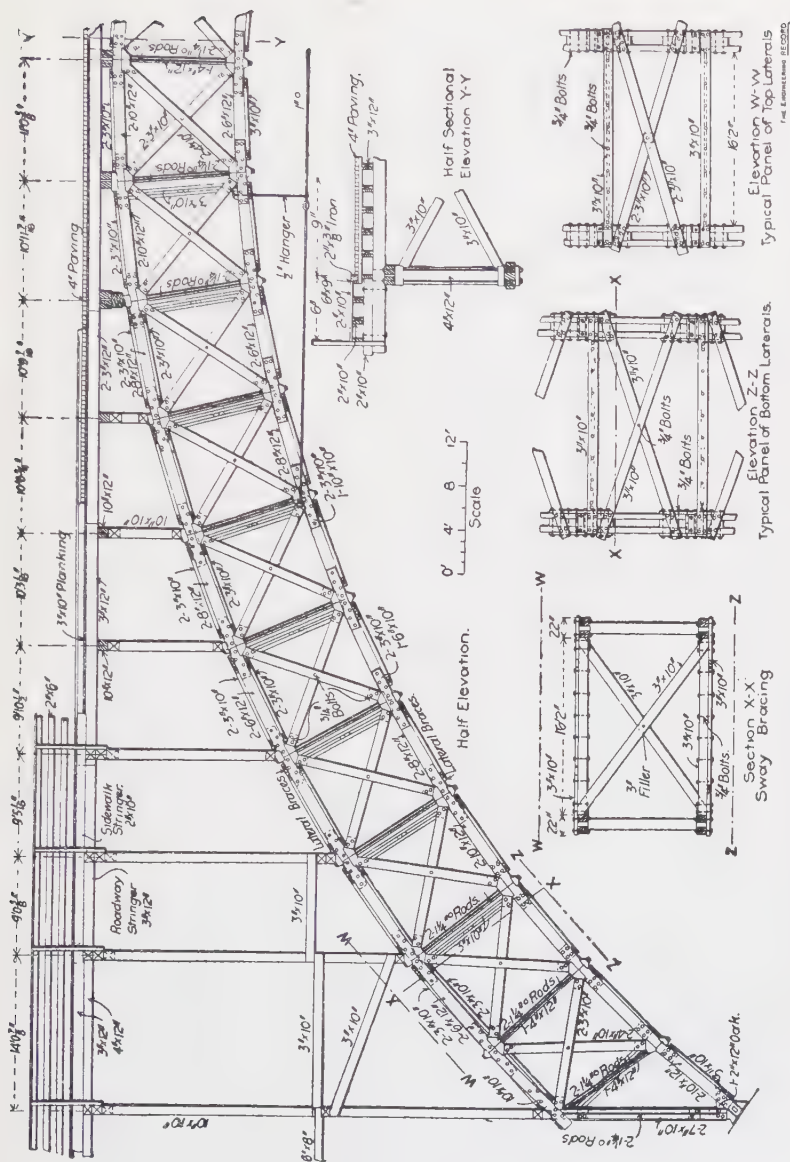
Wooden Trussed Arch Bridge over Mendota Ravine, near St. Paul, Minn.
